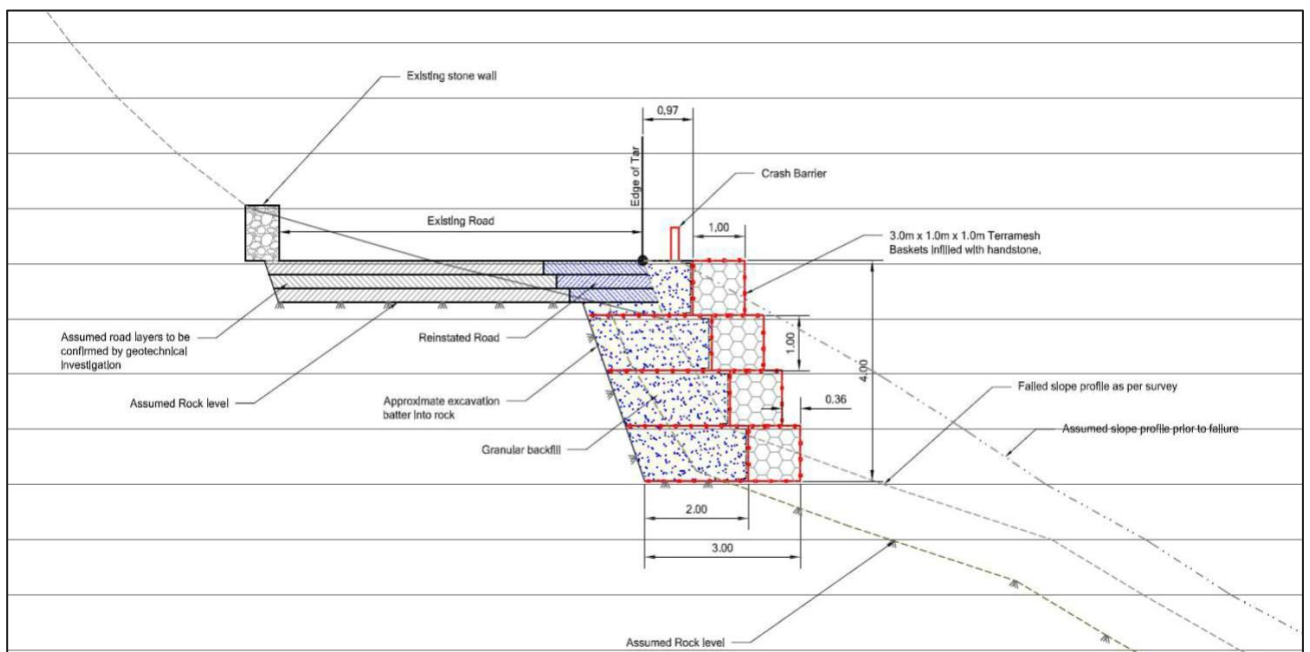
Terramesh retaining wall concept (Ingerop, 2024)
